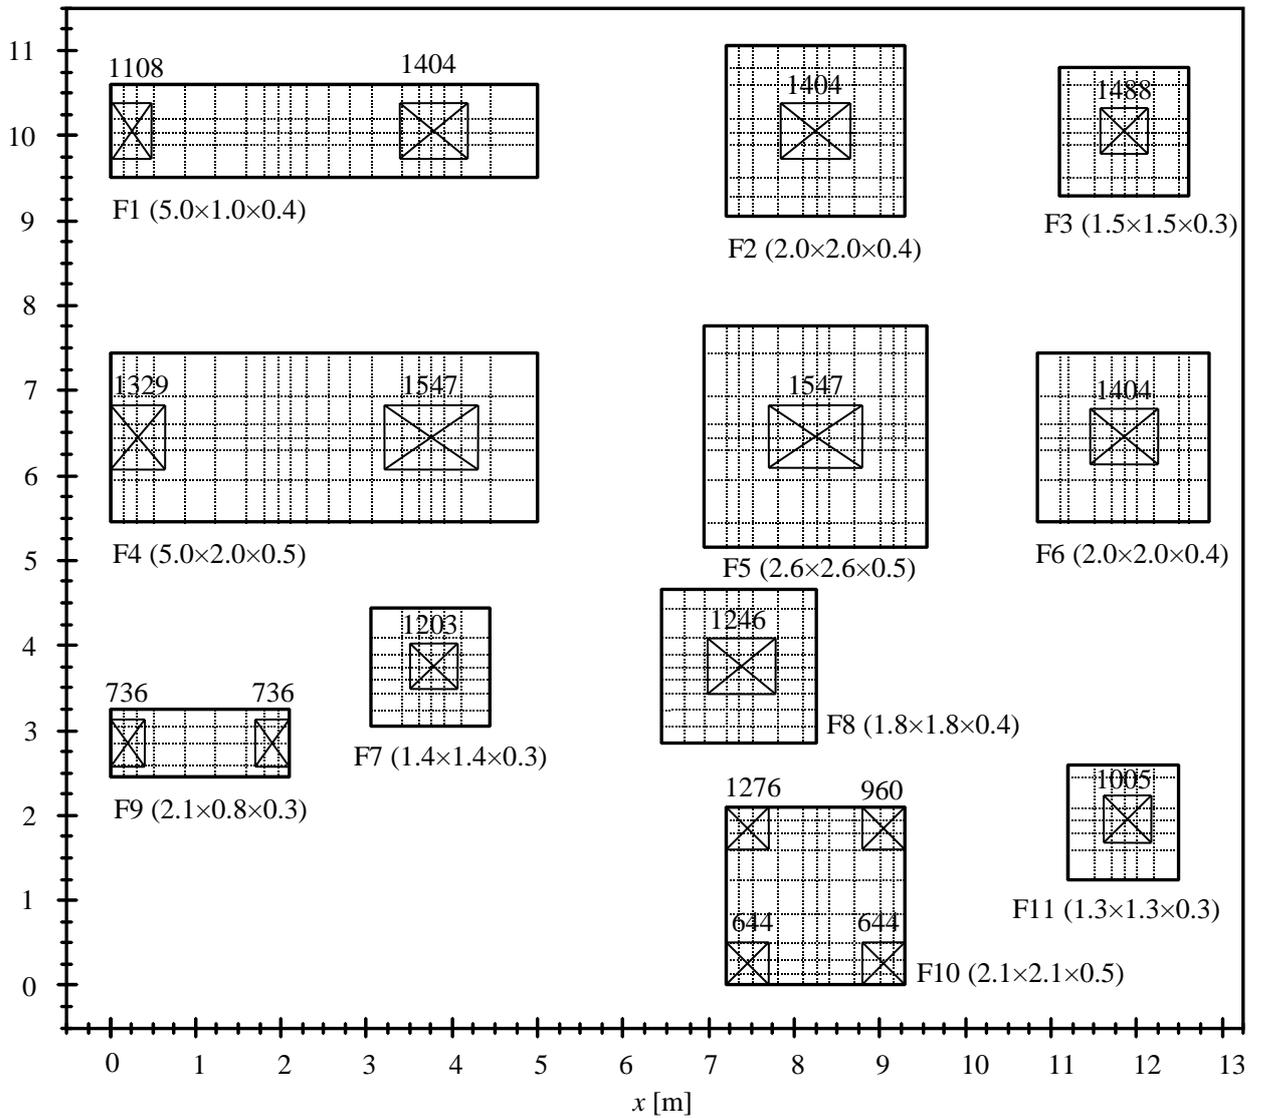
FE-Net of footings without tie beams, loads [kN/ m²] and footing dimensions [m]
